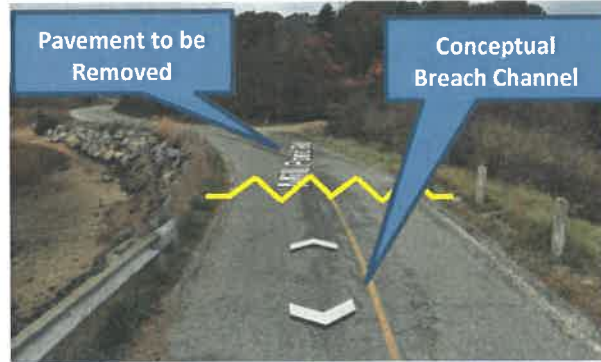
Approximate Limit of Pavement Removal and Channel Breach North of Mill Pond Culvert (facing north)
